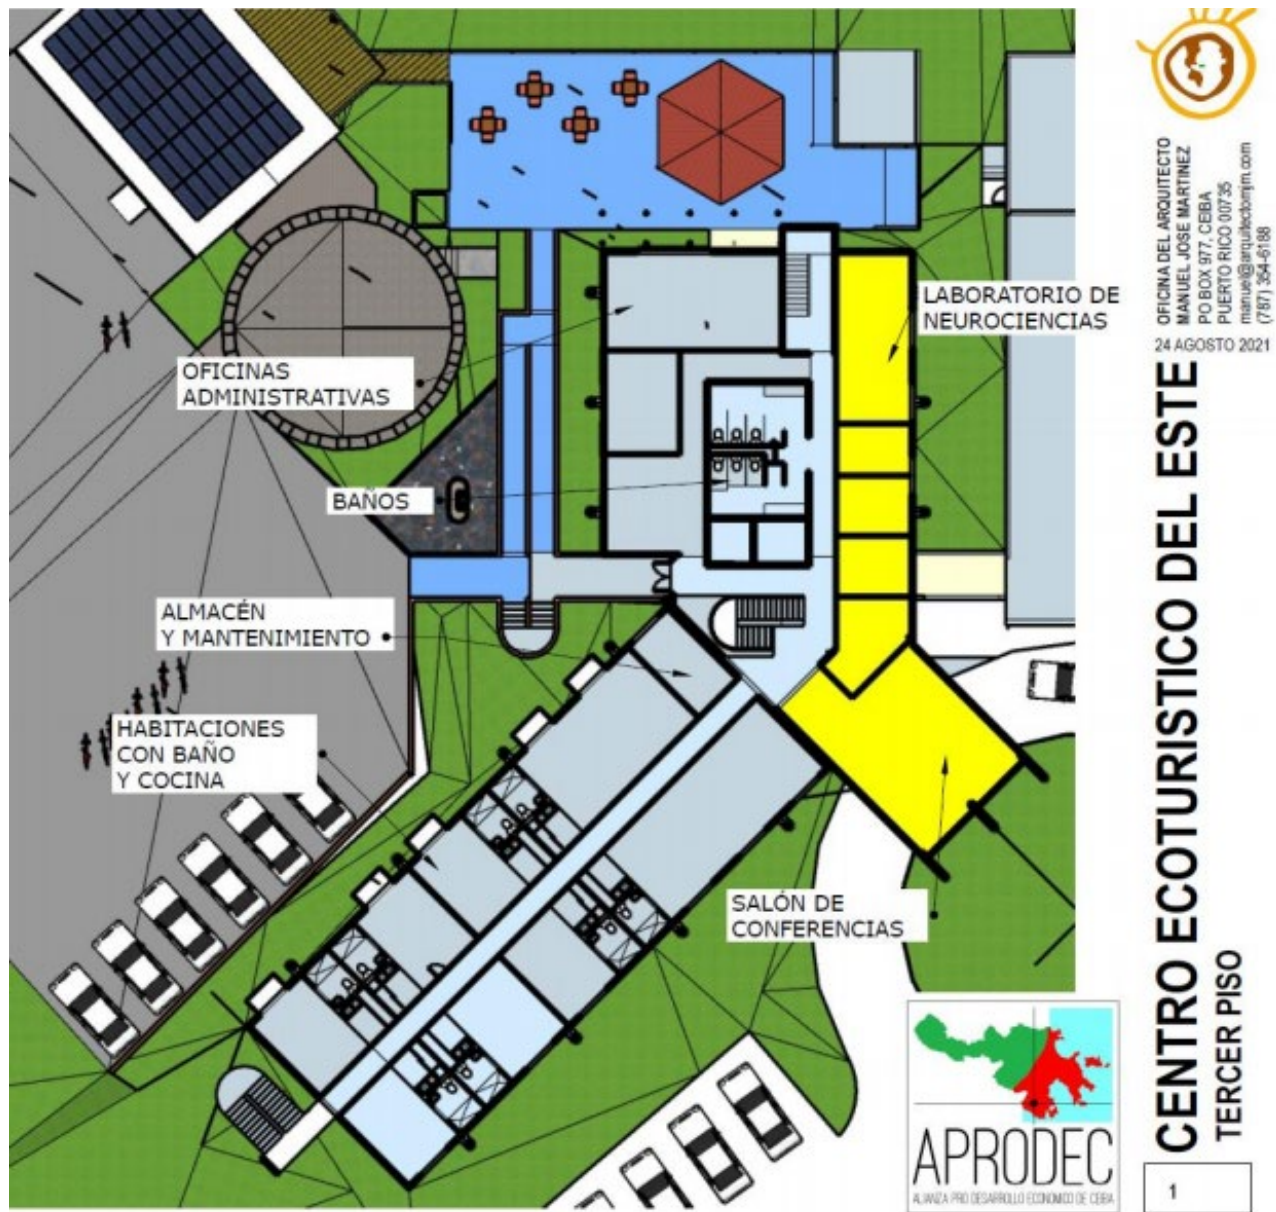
## EXHIBIT H: DRAWING SHOWING PROPOSED SECOND FLOOR - APRODEC
